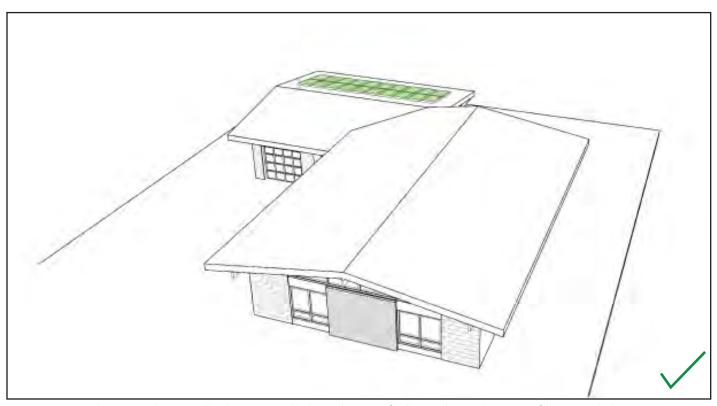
Solar panels installed are parallel to the roof plane, have low profiles, and do not overhanging or alter the existing roofline.
